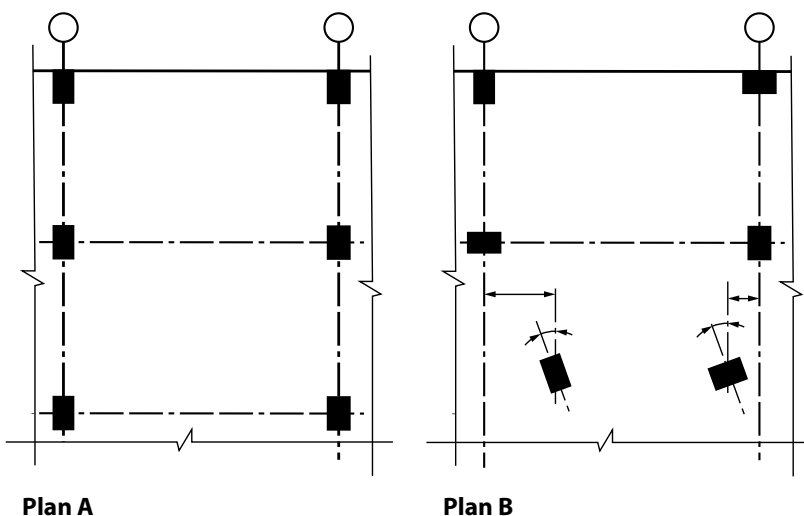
Consistency and repeatability are critical for constructability. In contrast to Plan B, the columns in Plan A have consistent size and orientation, allowing the contractor to design and furnish advanced table panel floor formwork and reduce likelihood of layout errors.
